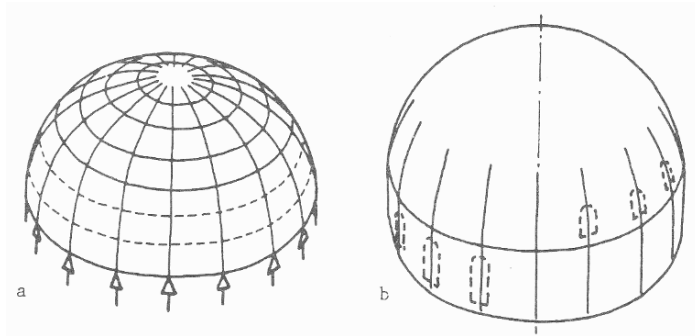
Schematic presentation of dome structural system and cracks in the dome masonry structure
